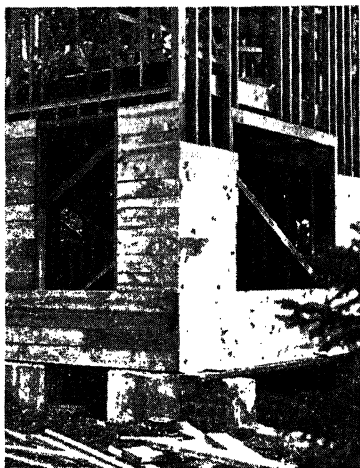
A.—The cheaper method. Horizontal sheathing allows vibration in high winds. (Courtesy of Alexander Houses, Inc.)
